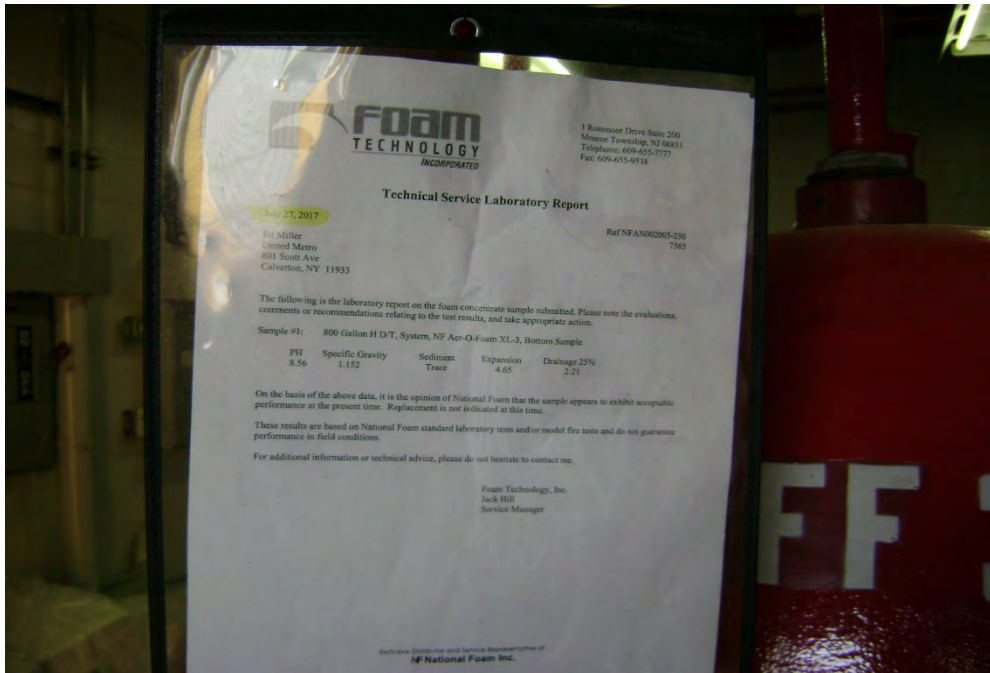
Building 327 - FFFP Technical Service Laboratory Report
